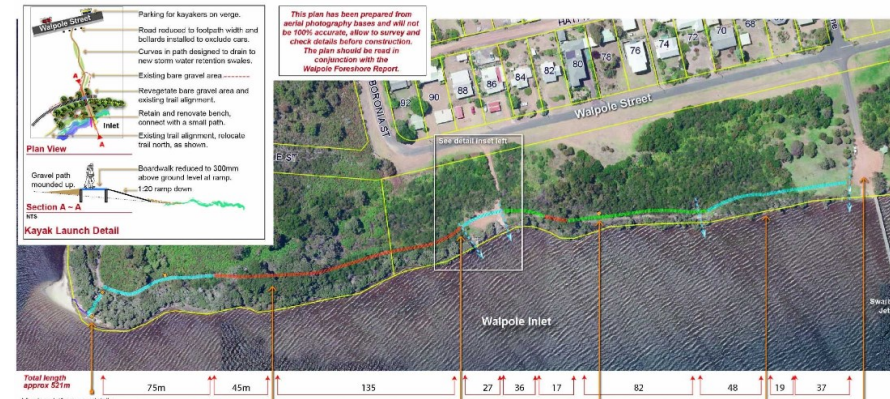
Walpole Inlet Foreshore Enhancement Plan
